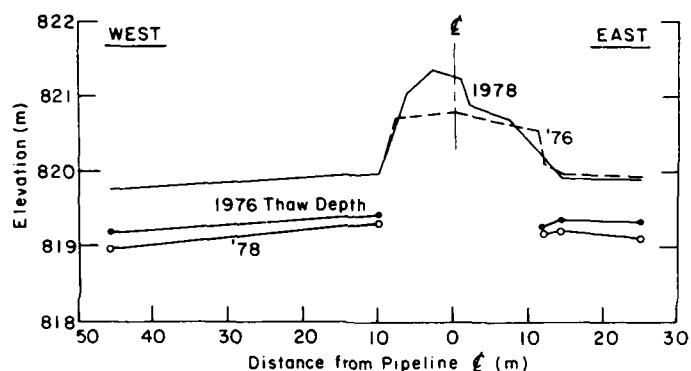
Surface elevations on cross section A-A, pipeline workpad, Access Road 114-APL-3.
